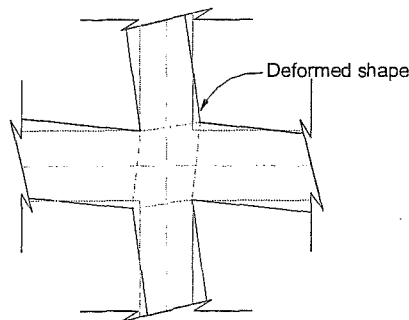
Deformed shape of beam-column joint when subject to lateral forces
